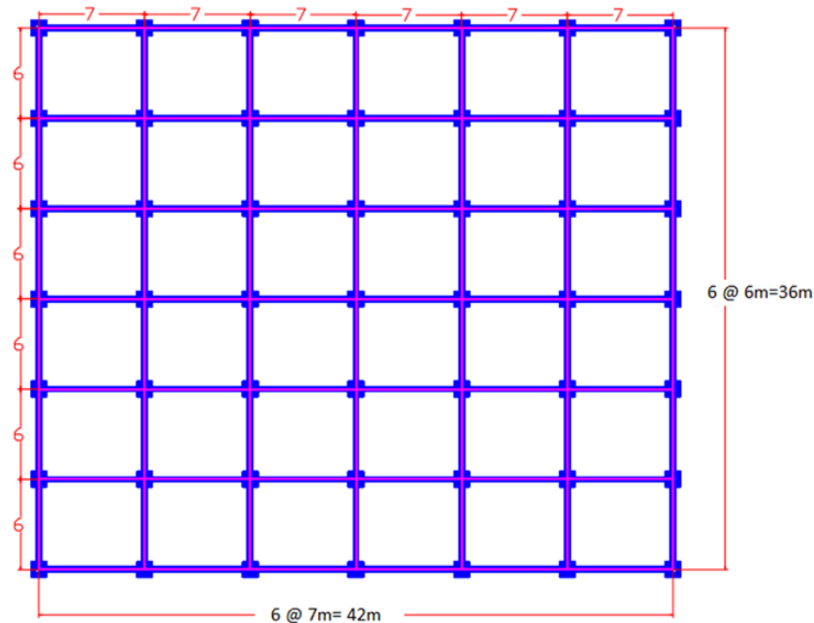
2: Plan of the model braced with bare frame, shear wall or steel bracing
